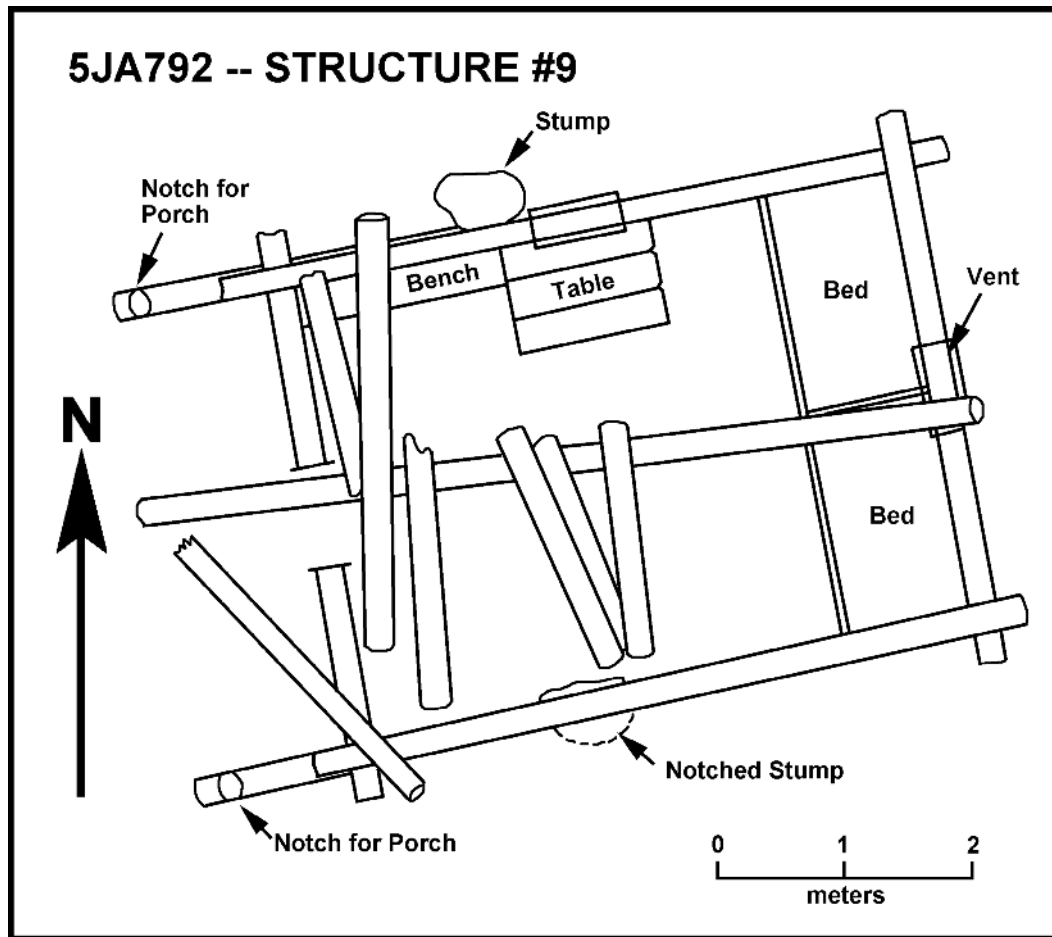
Plan view of structure #9, residence cabin; site 48CR5300/5JA792.
